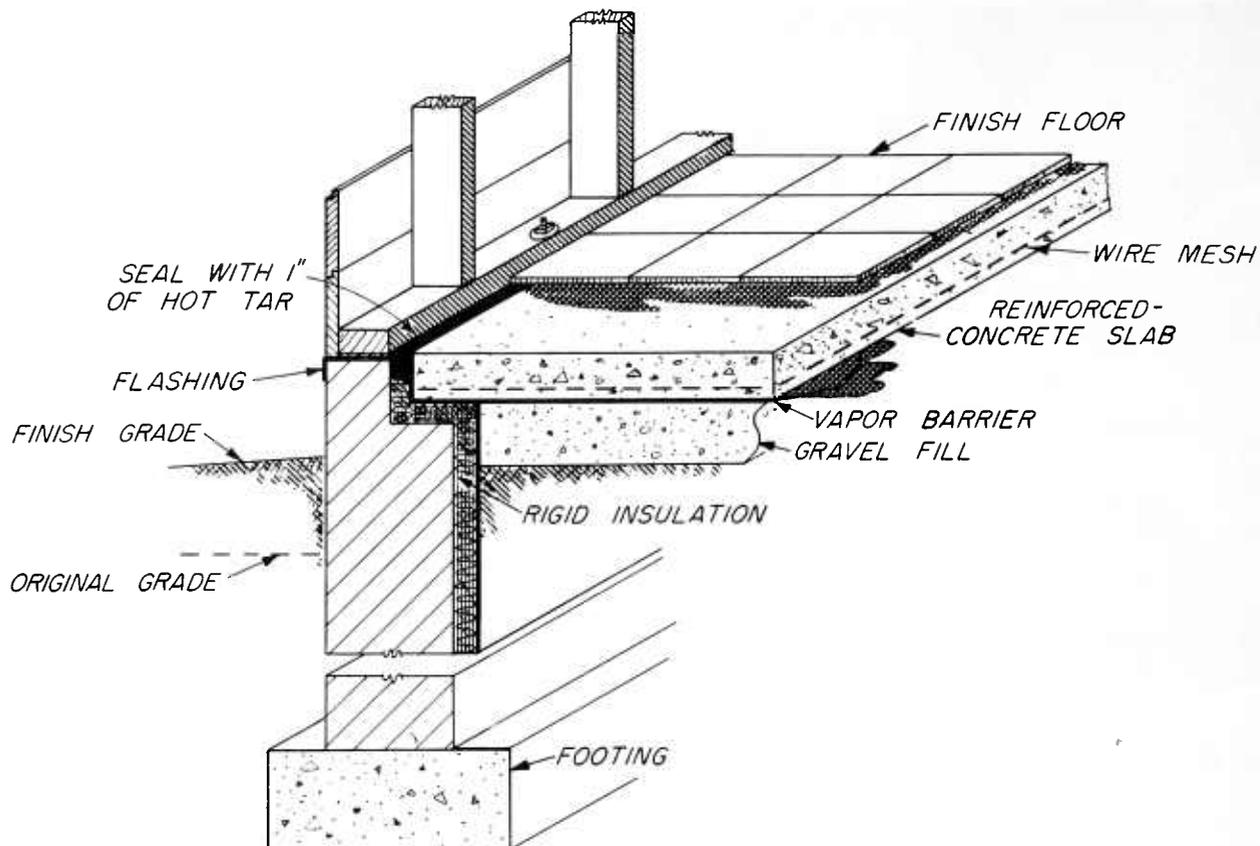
Concrete slab with foundation walls. Insulation is located around the exterior walls. Vapor barriers are installed below the slab and on the warm side of the insulation, as shown. Insulation extends to within 1 inch of top of floor slab, and the space above the insulation to the top of the slab is sealed off with hot tar.
